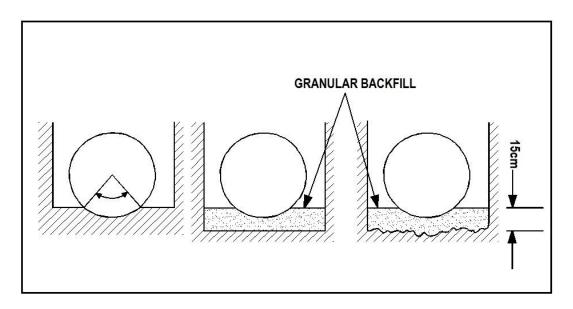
Backfill for Corrugated Steel Pipe Culverts
